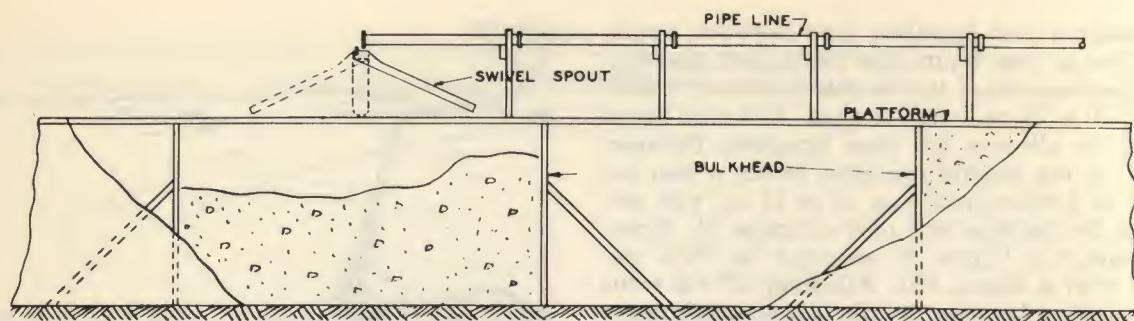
Method of pouring wall in alternate sections where expansion joints are specified at fairly close intervals. Pouring starts on short end so pipeline will be in place for remaining sections next day.
